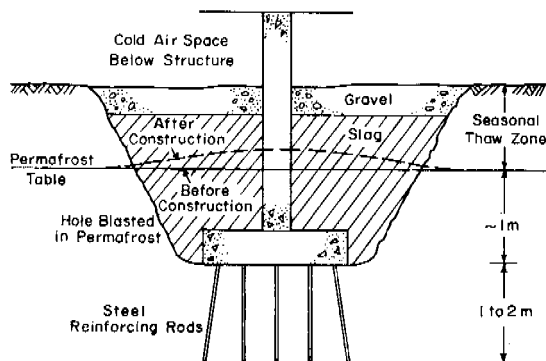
Typical cast-in-place concrete footings supported on permafrost.
